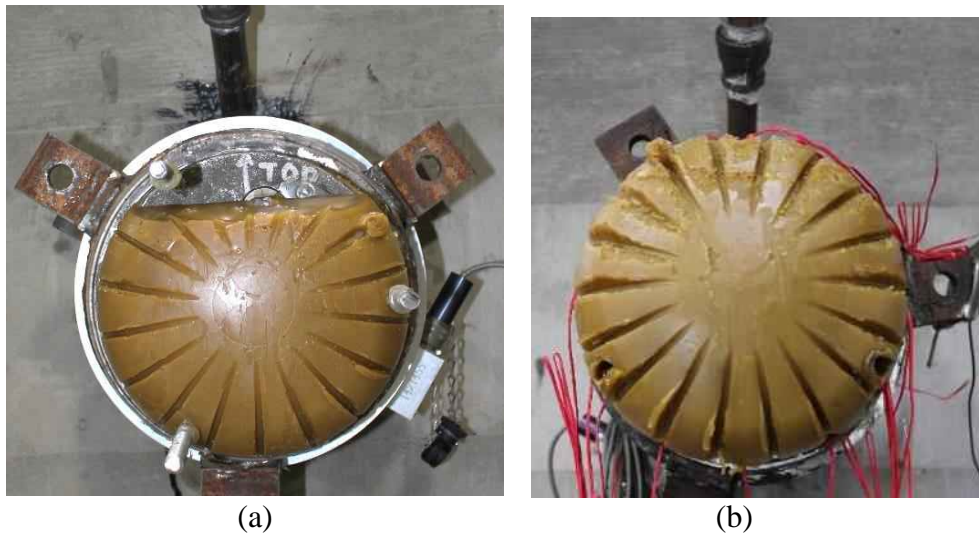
Outlet (dead end) after cap removal (a) IWS and (b) IWC
